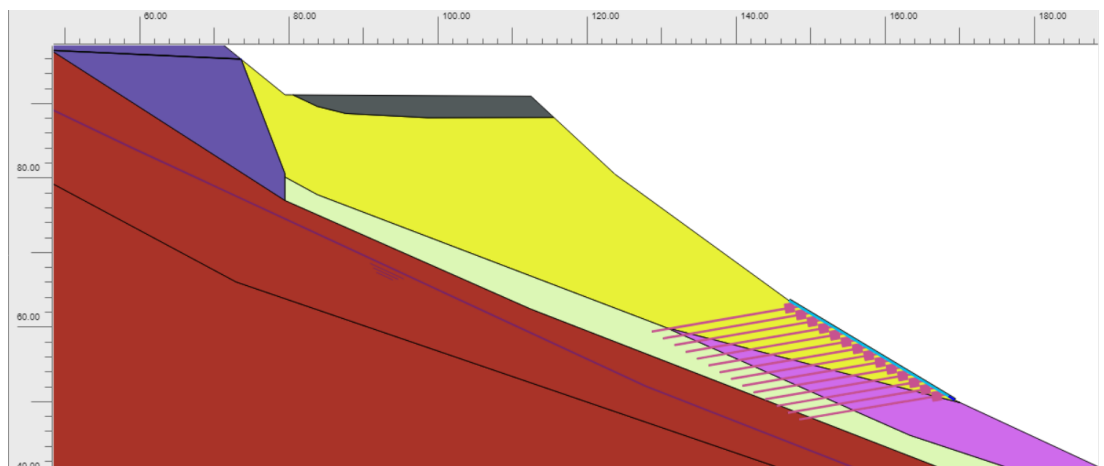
Soil Nail layout with 1.2m spacing and 10 degree inclination
